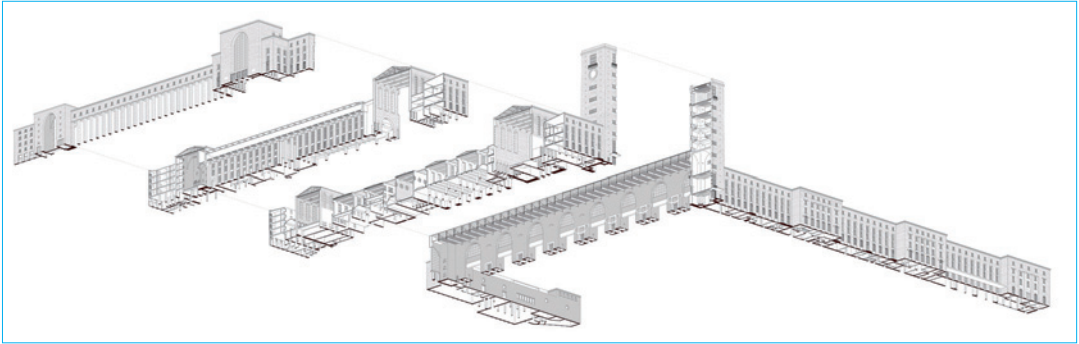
Axonometric section of the railway building at the time of the first version of the building (1928). Made by M. Balestra, M. Carbone, L. Fornarelli, F. Franciolapilla, L. Musaio Somma, A. R. Saponara, F. Strada
